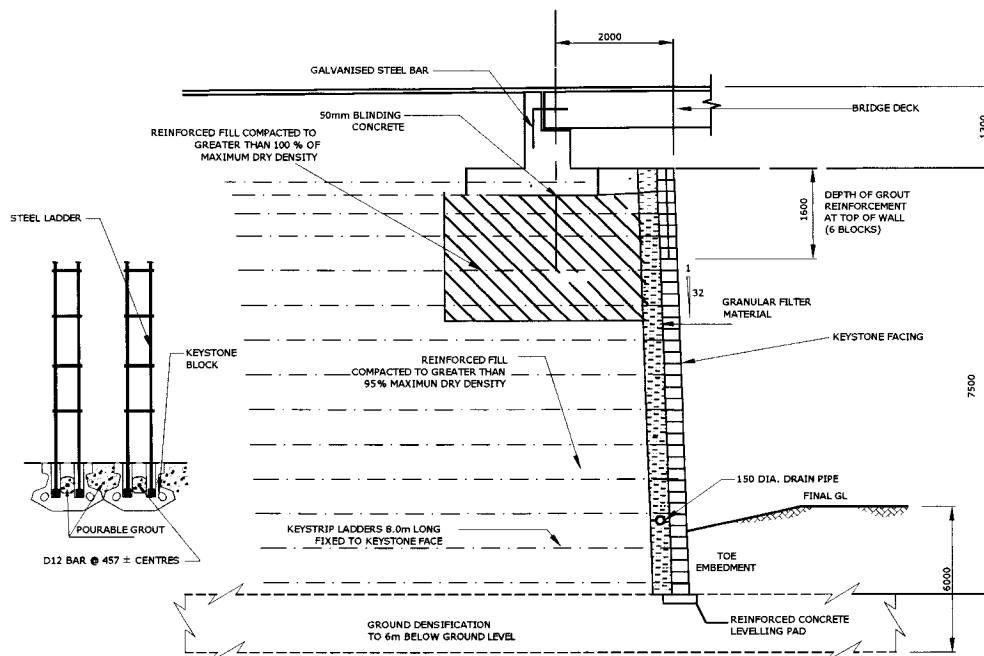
Tahuna Bridge Steel Ladder Reinforced Abutment with KeyStone Facing
